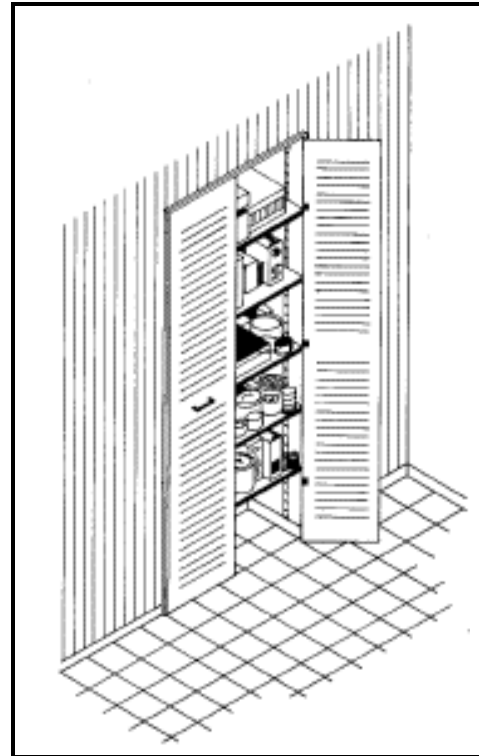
Narrow doors and shallow, adjustable shelving make this pantry adaptable to any user.
